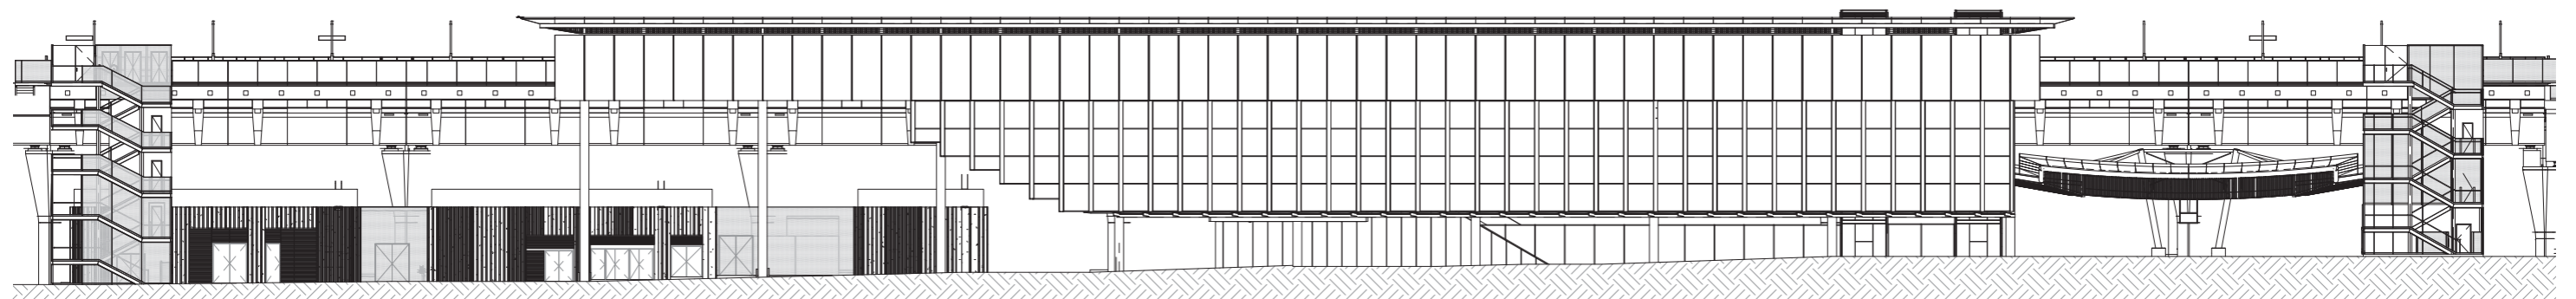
Rouse Hill Elevation . Source: HASSELL
